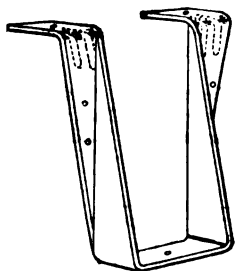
"Ideal" Wrought-steel Beam-hanger
